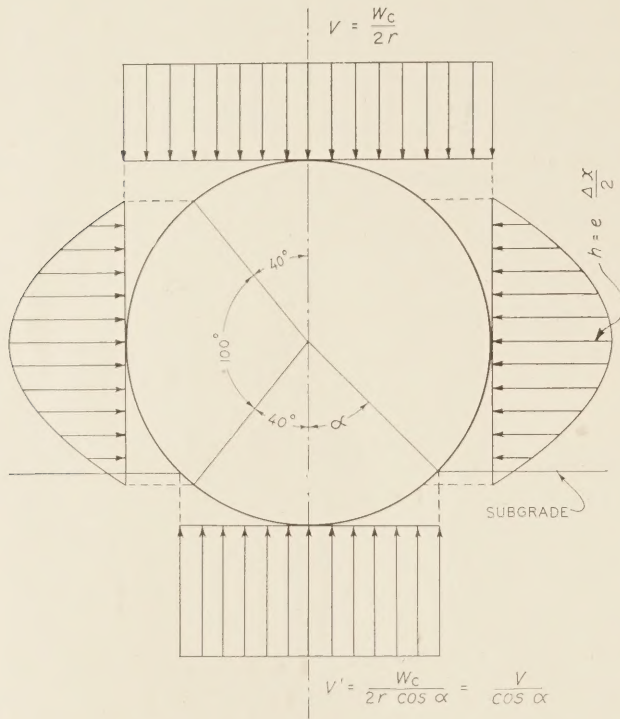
HYPOTHETICAL DISTRIBUTION OF PRESSURE ON A FLEXIBLE CULVERT PIPE UNDER AN EARTH FILL.
